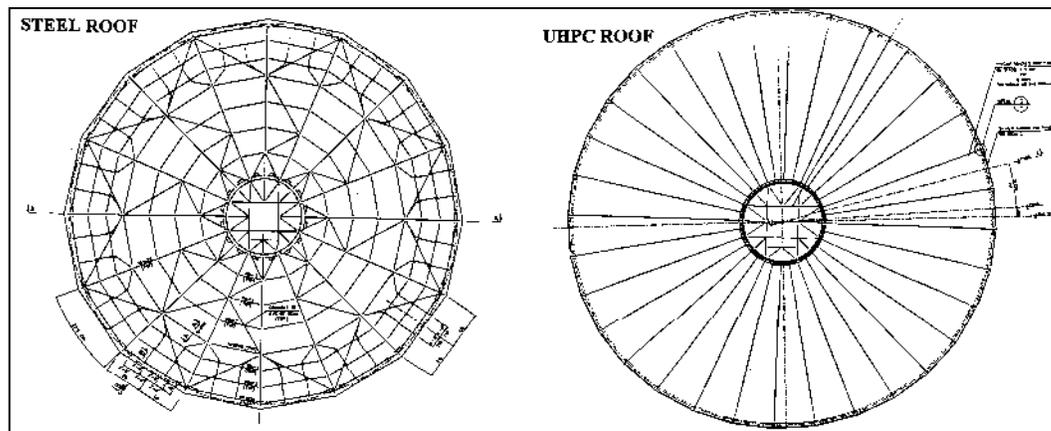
Steel framing (left) vs. precast framing (right) for the silo roof
